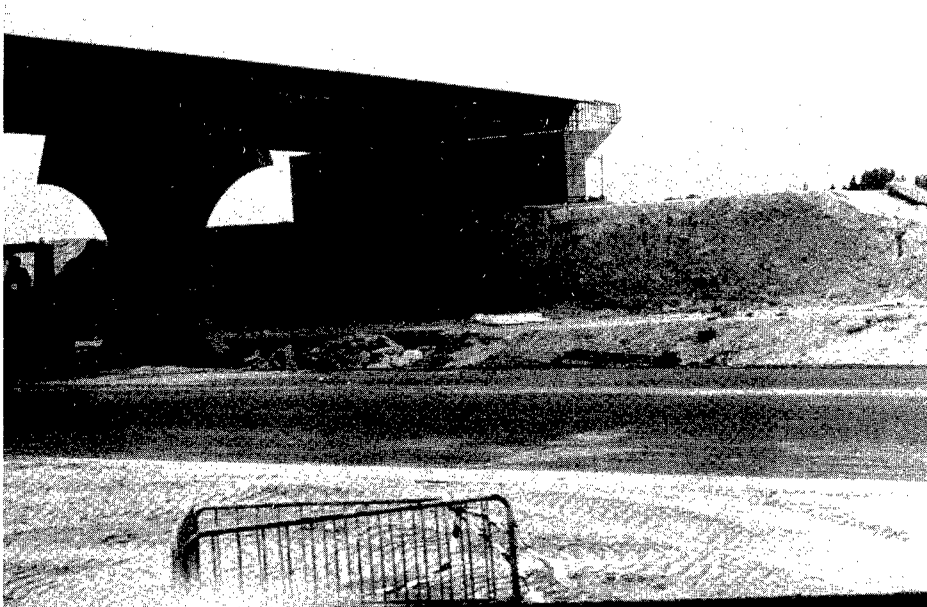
Bridge overpass structure—ring road construction, Madrid.
